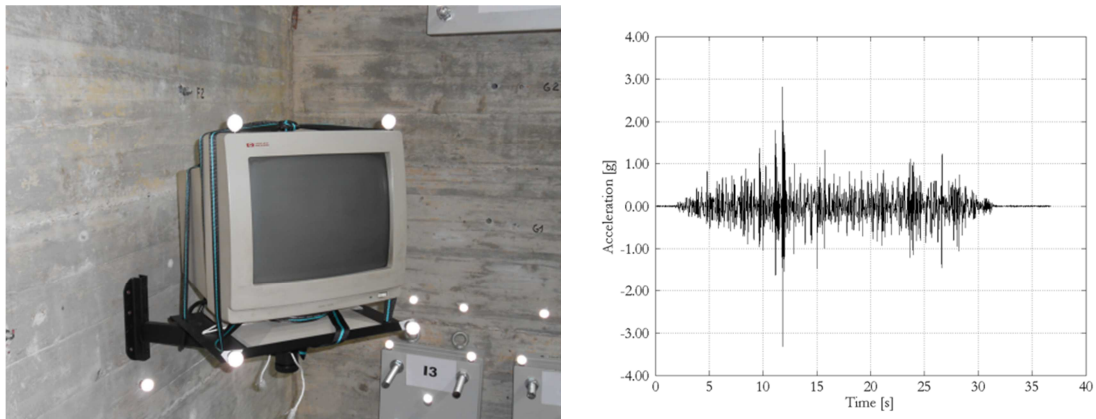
Anchorage of a monitor to concrete wall by means of six fixing points with PFE anchors
